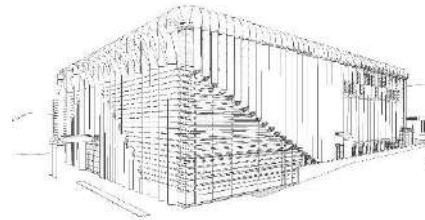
Vertical fins on west façade and horizontal fins on south façade (*Personal Rendering*)
